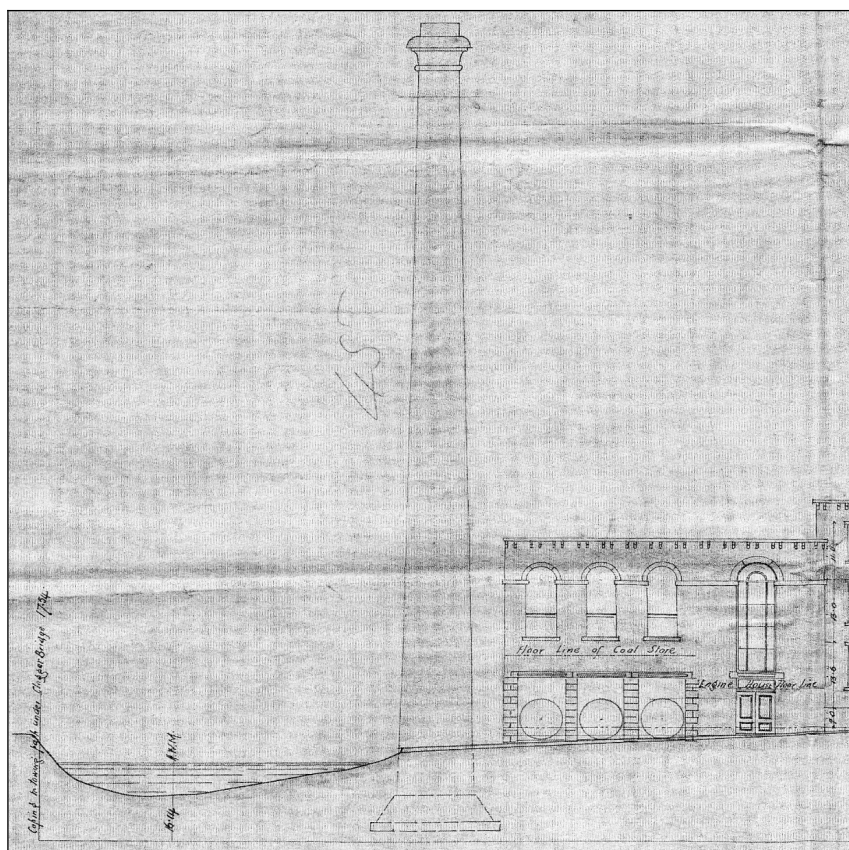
Part of 1891 section/elevation, showing chimney, with boiler and engine houses
